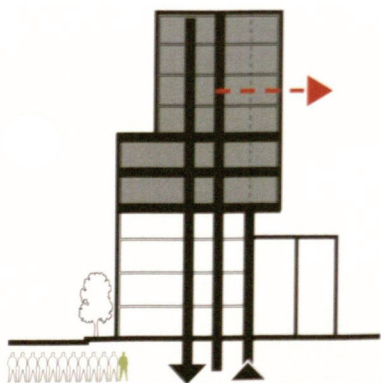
“ Only SHoP Architects proposed a six-floor cantilever.”
